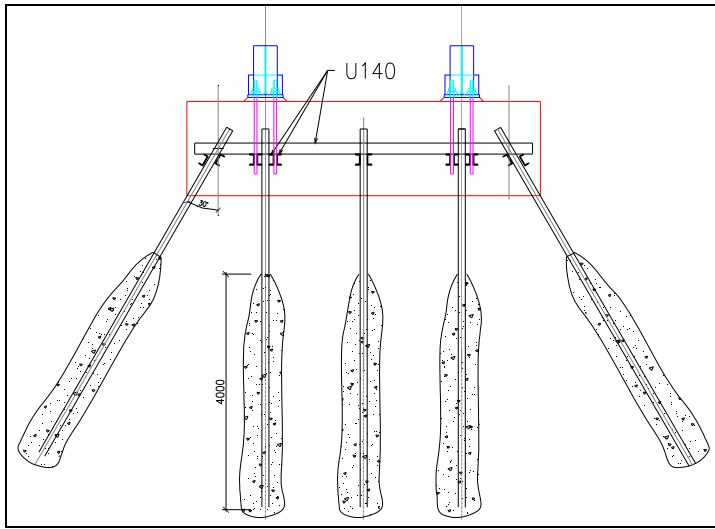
Continuous strip footing with the micropiles and anchoring grate
